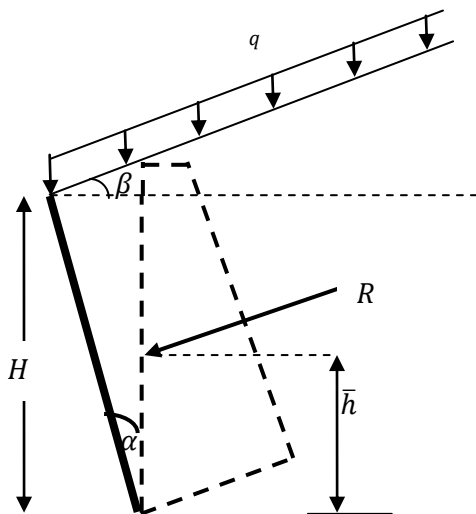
Multi layer soils with a retaining wall of inclined back face and inclined ground
